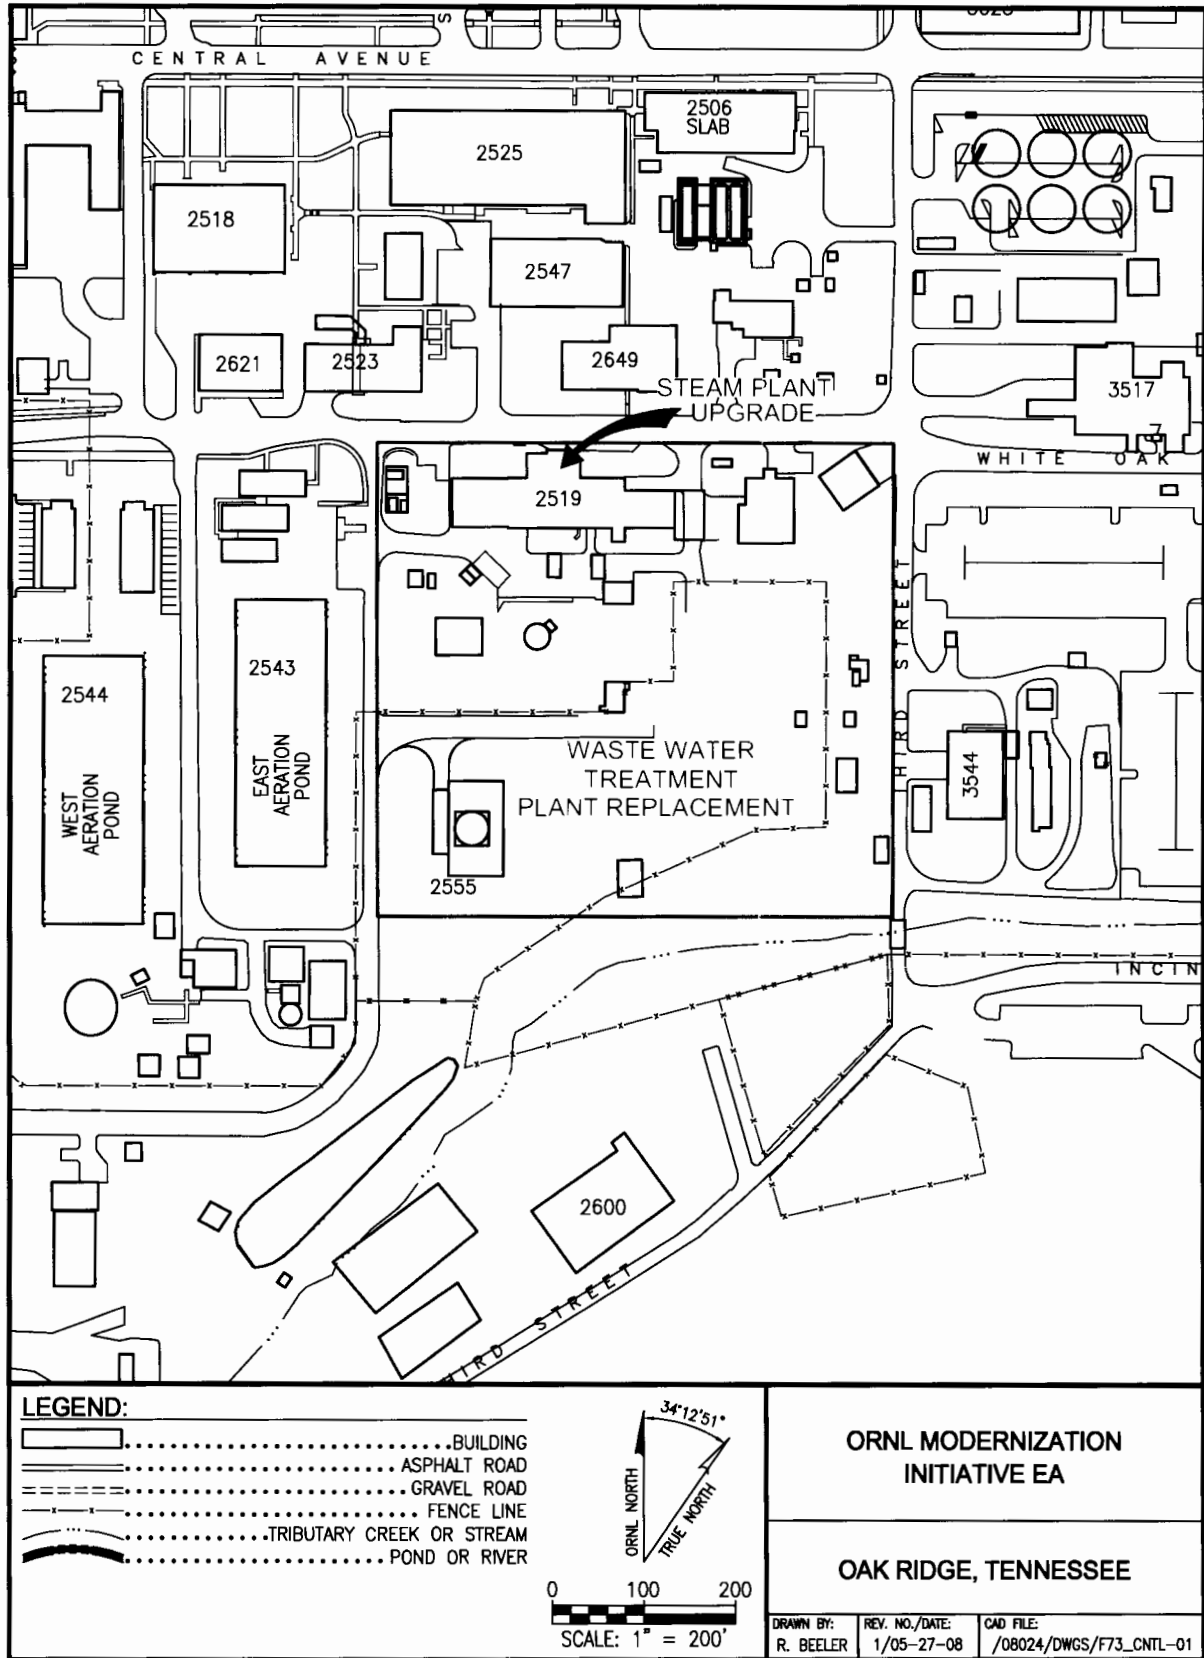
Central Campus steam plant upgrade and wastewater treatment plant replacement.
